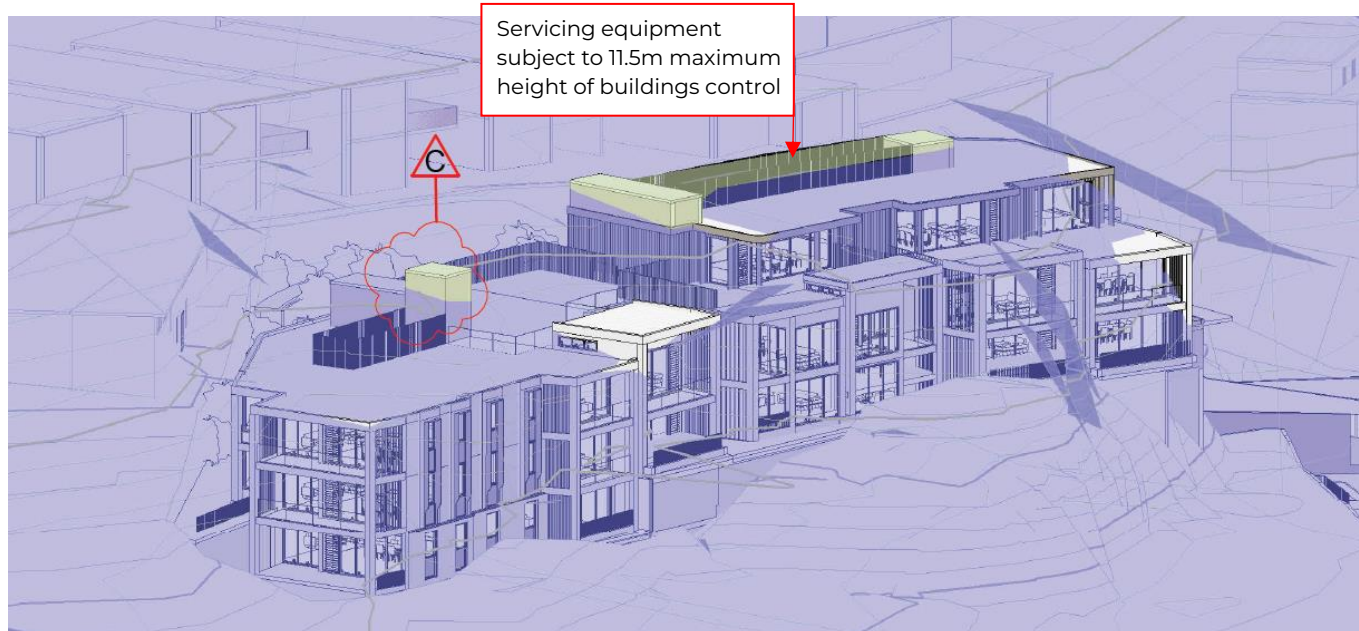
Building elements which vary the 9.5m height shown in white (servicing equipment subject to 11.5m height of buildings control)
